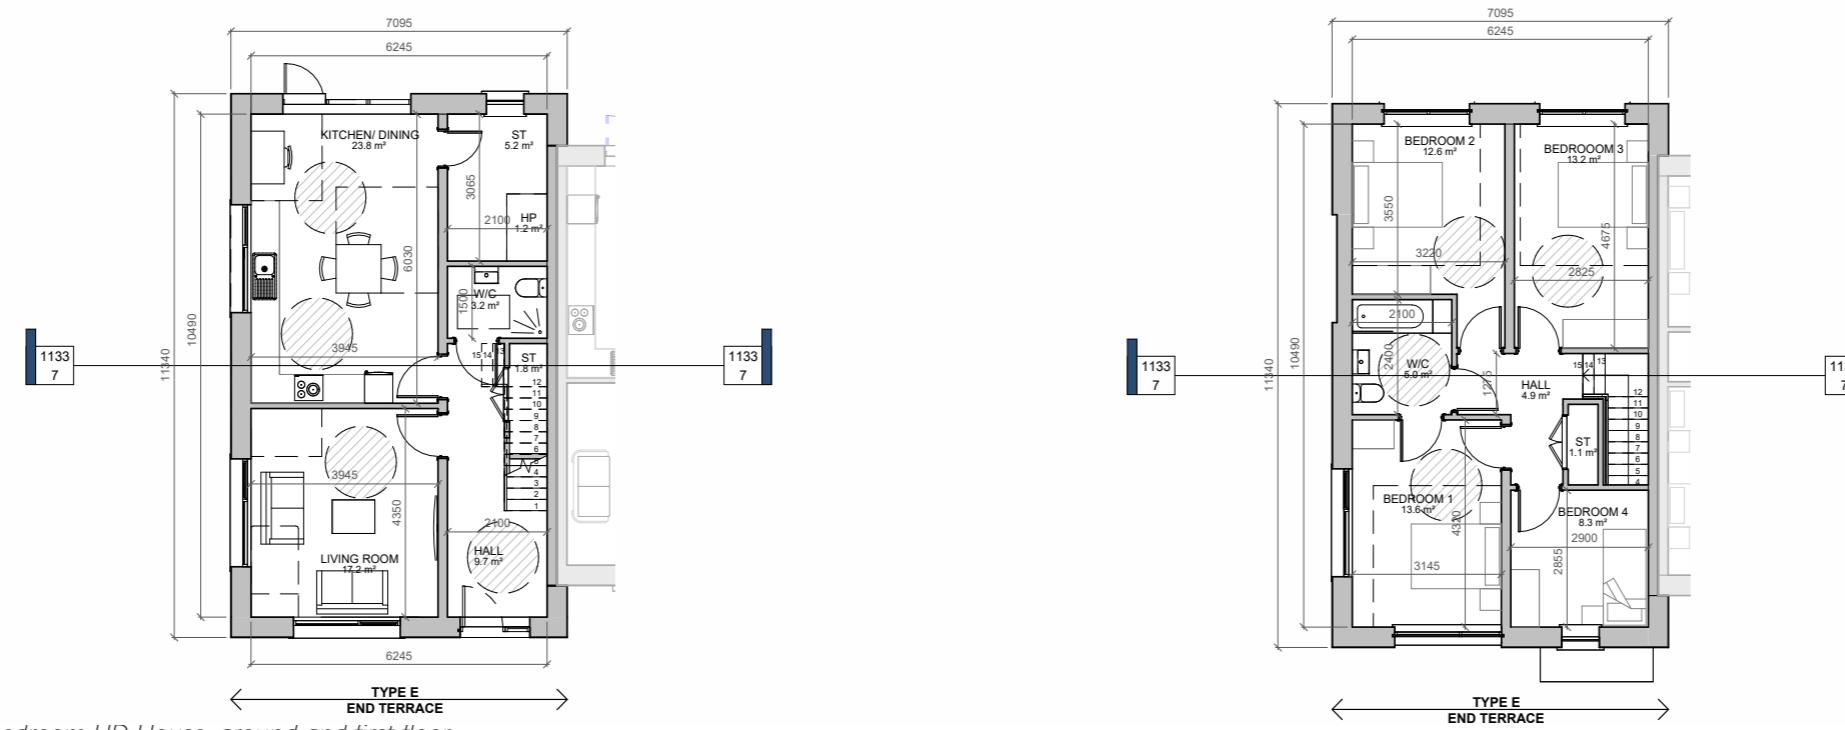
House Type H-4B7P-2; 4-bedroom UD House, ground and first floor
